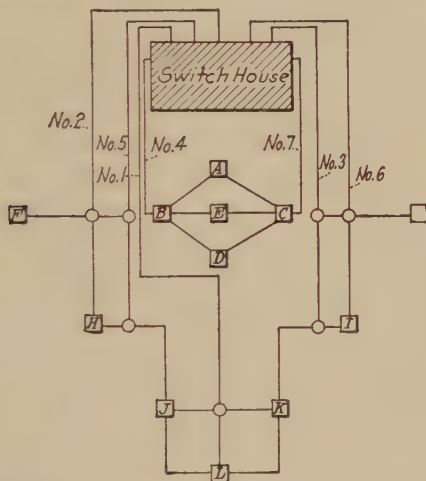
Diagram showing the seven duct runs leaving switch house and going to various substations.
